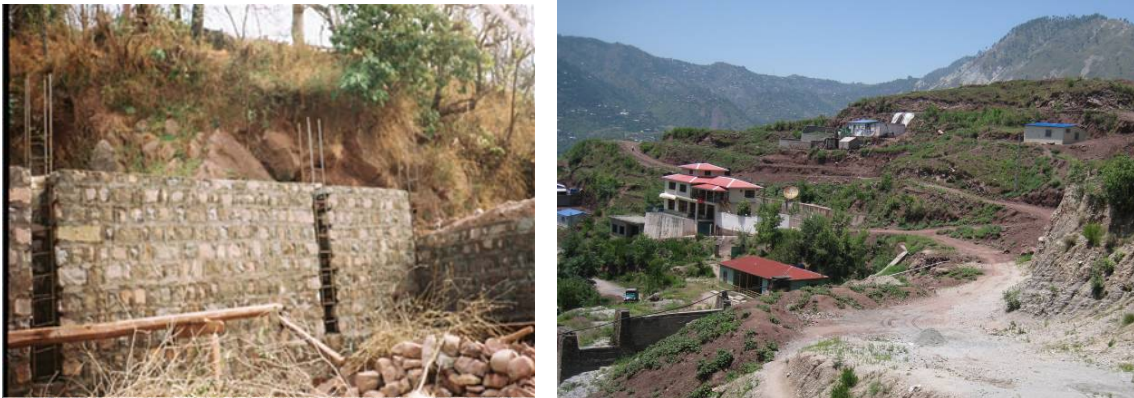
Construction of the new house with their back wall facing the natural slope (Photo by Kazmi, 2008)
